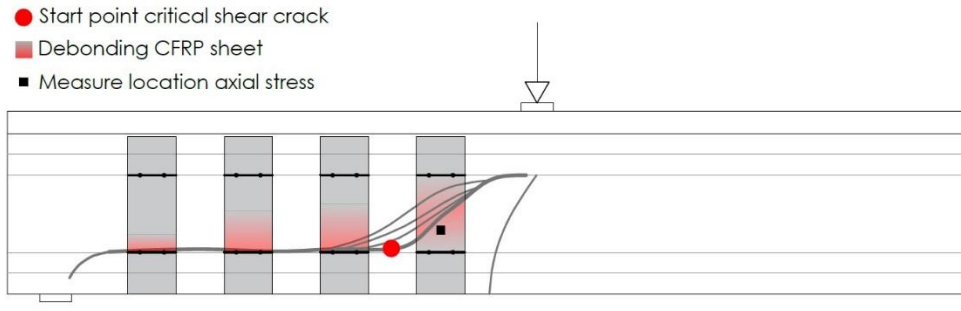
Crack pattern and CFRP debonding specimen I-VA-SP3 at load step 29
